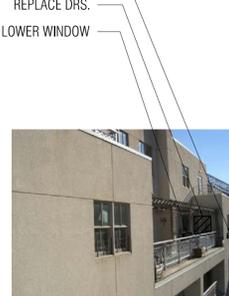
EXISTING SOUTHERN WINDOW AND SOUTH FACING TERRACE
